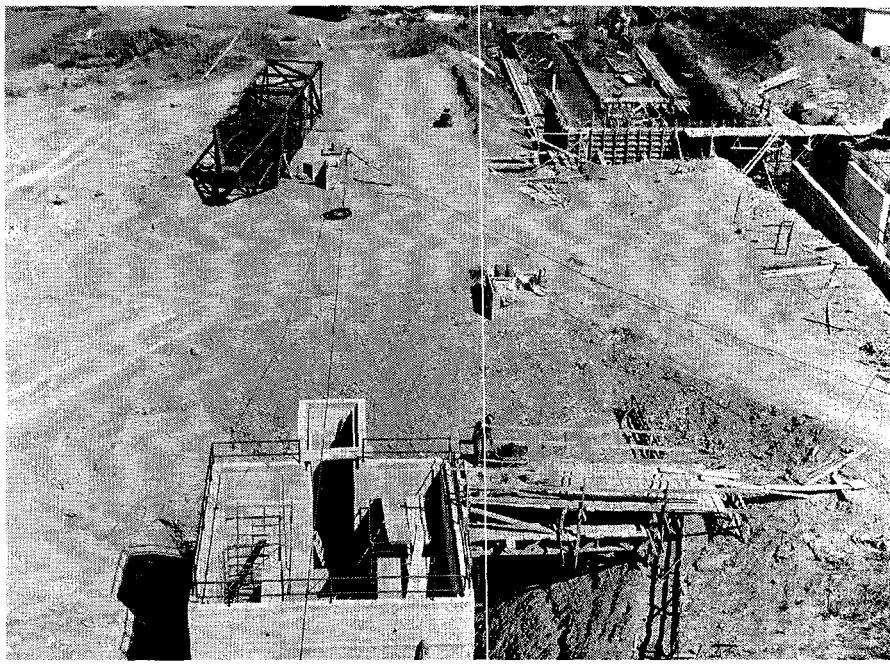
Reactor Concrete Pool and Control House under Construction.
